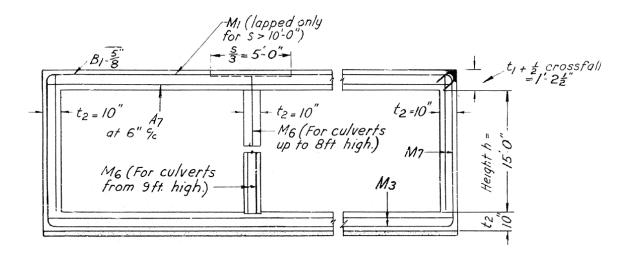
Culvert reinforcement detail (Source: WAE drawings)
